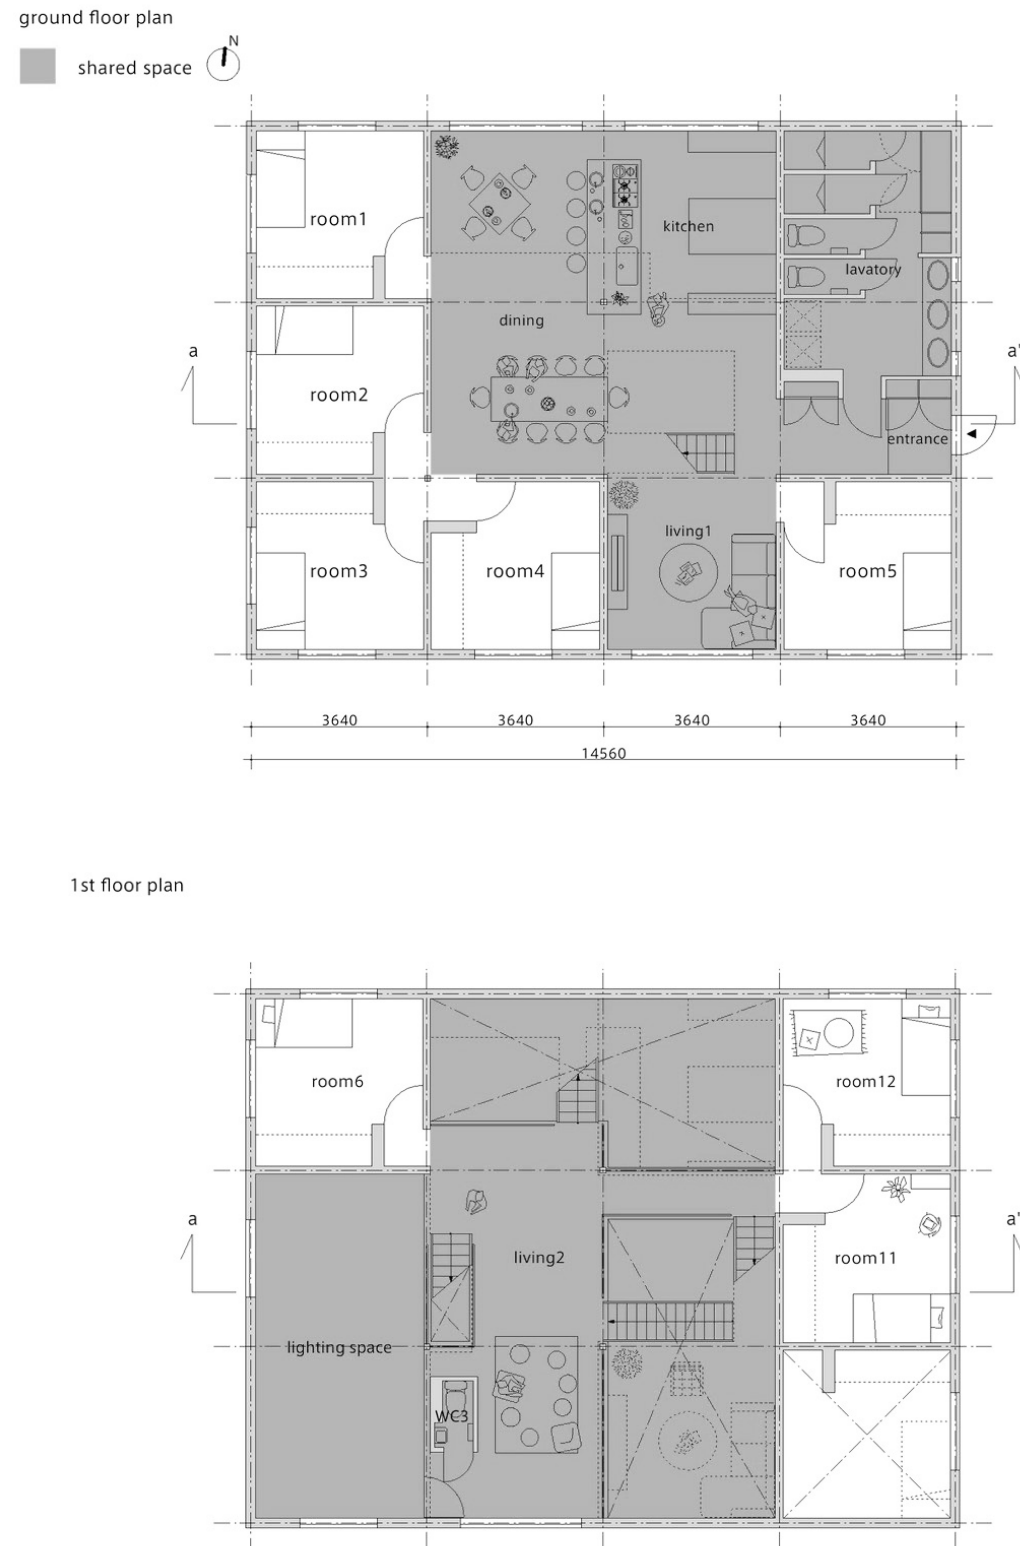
Floorplans LT Josai house, floorplans (Archdaily, n.d.)
